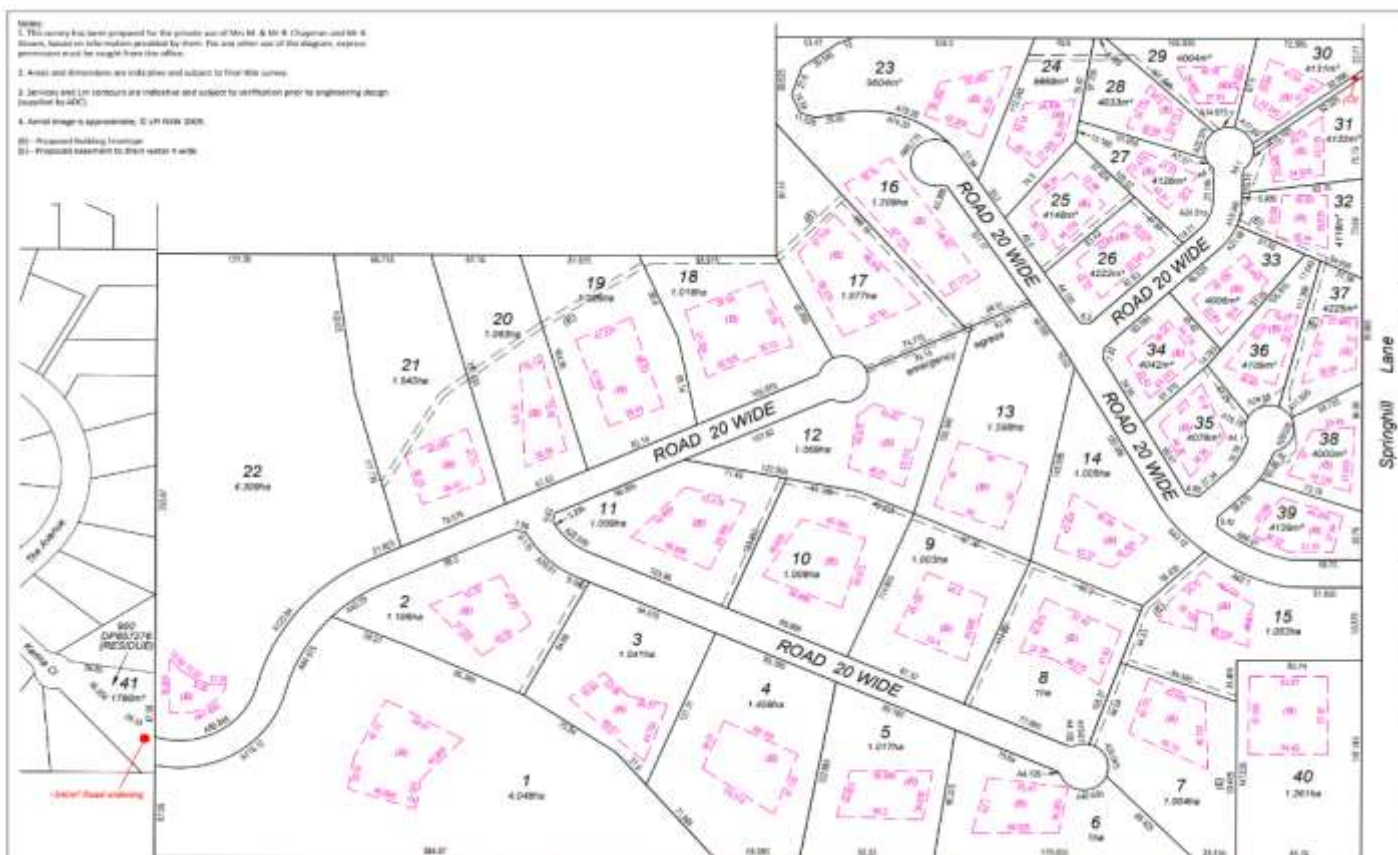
Amended Subdivision Layout with Lot Dimensions
